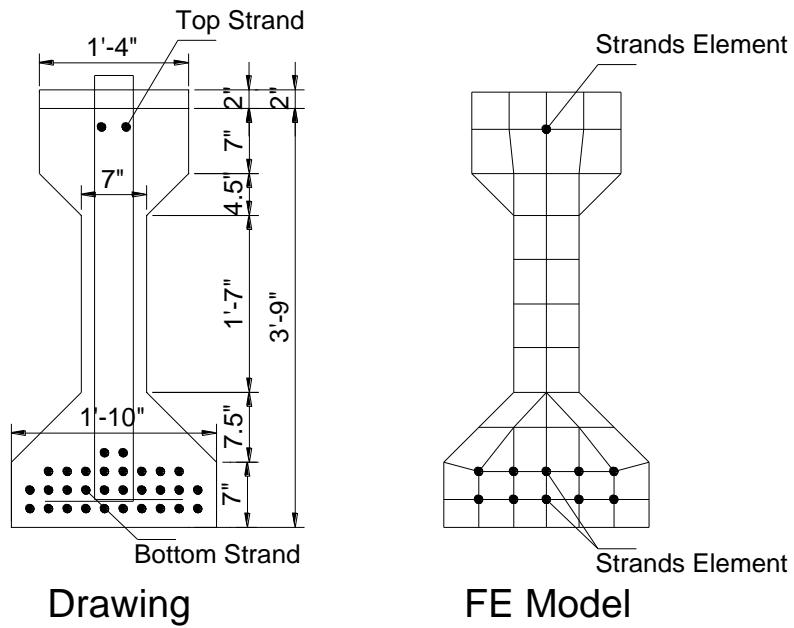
Cross-Sectional View of Archetype 3 Bridge Girder at Mid-Span: (Left) Actual Strands Distribution and (Right) Strand Elements in FE Model
